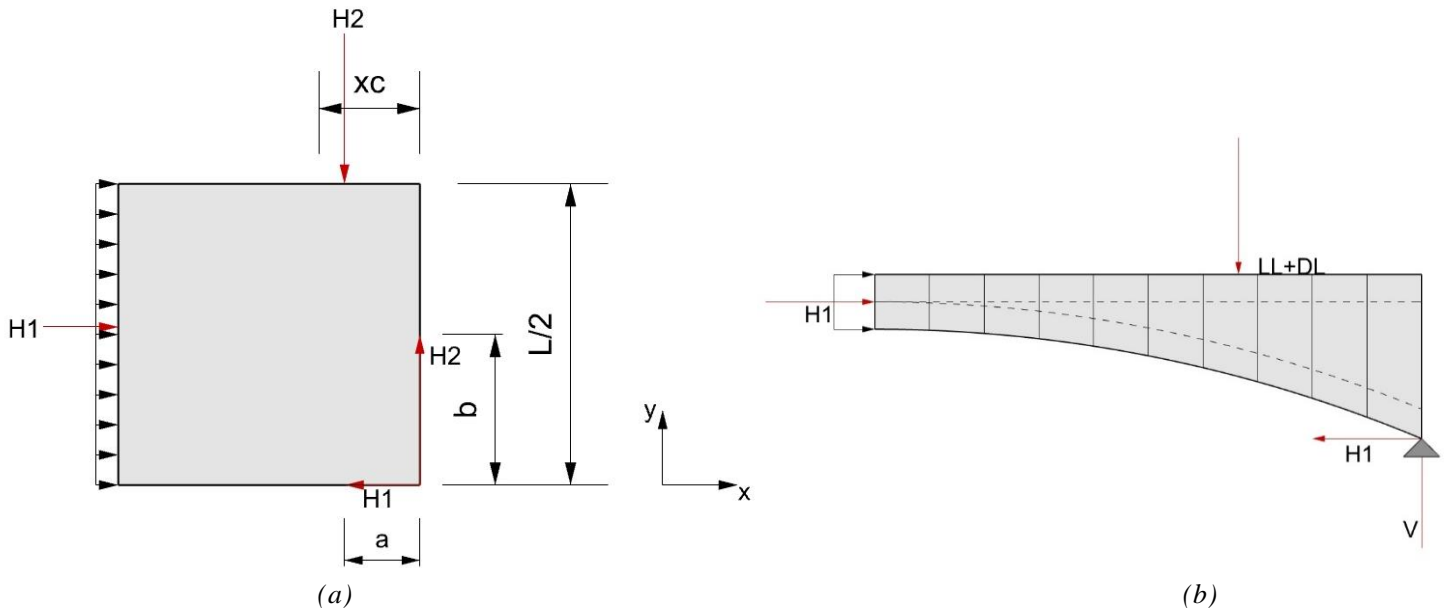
Plan view of offset forces (a) elevation view displaying support and direction of arch (b)
